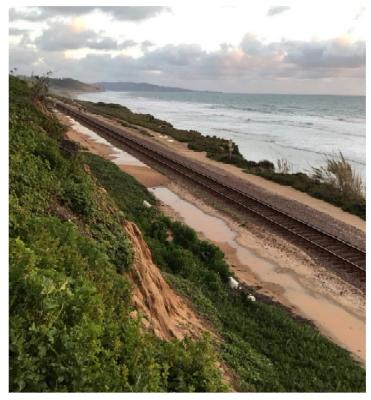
Existing Trackside Ditch North of Anderson Canyon
